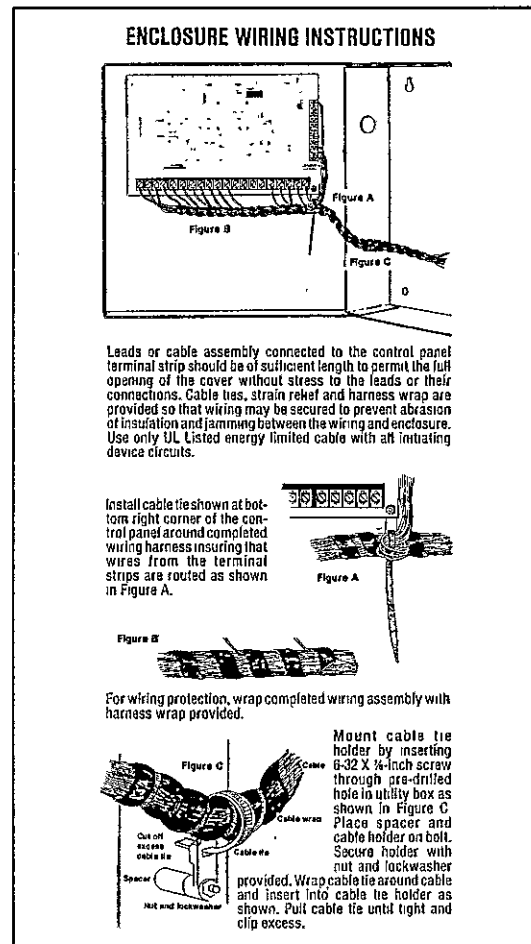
ENCLOSURE WIRING INSTRUCTIONS
